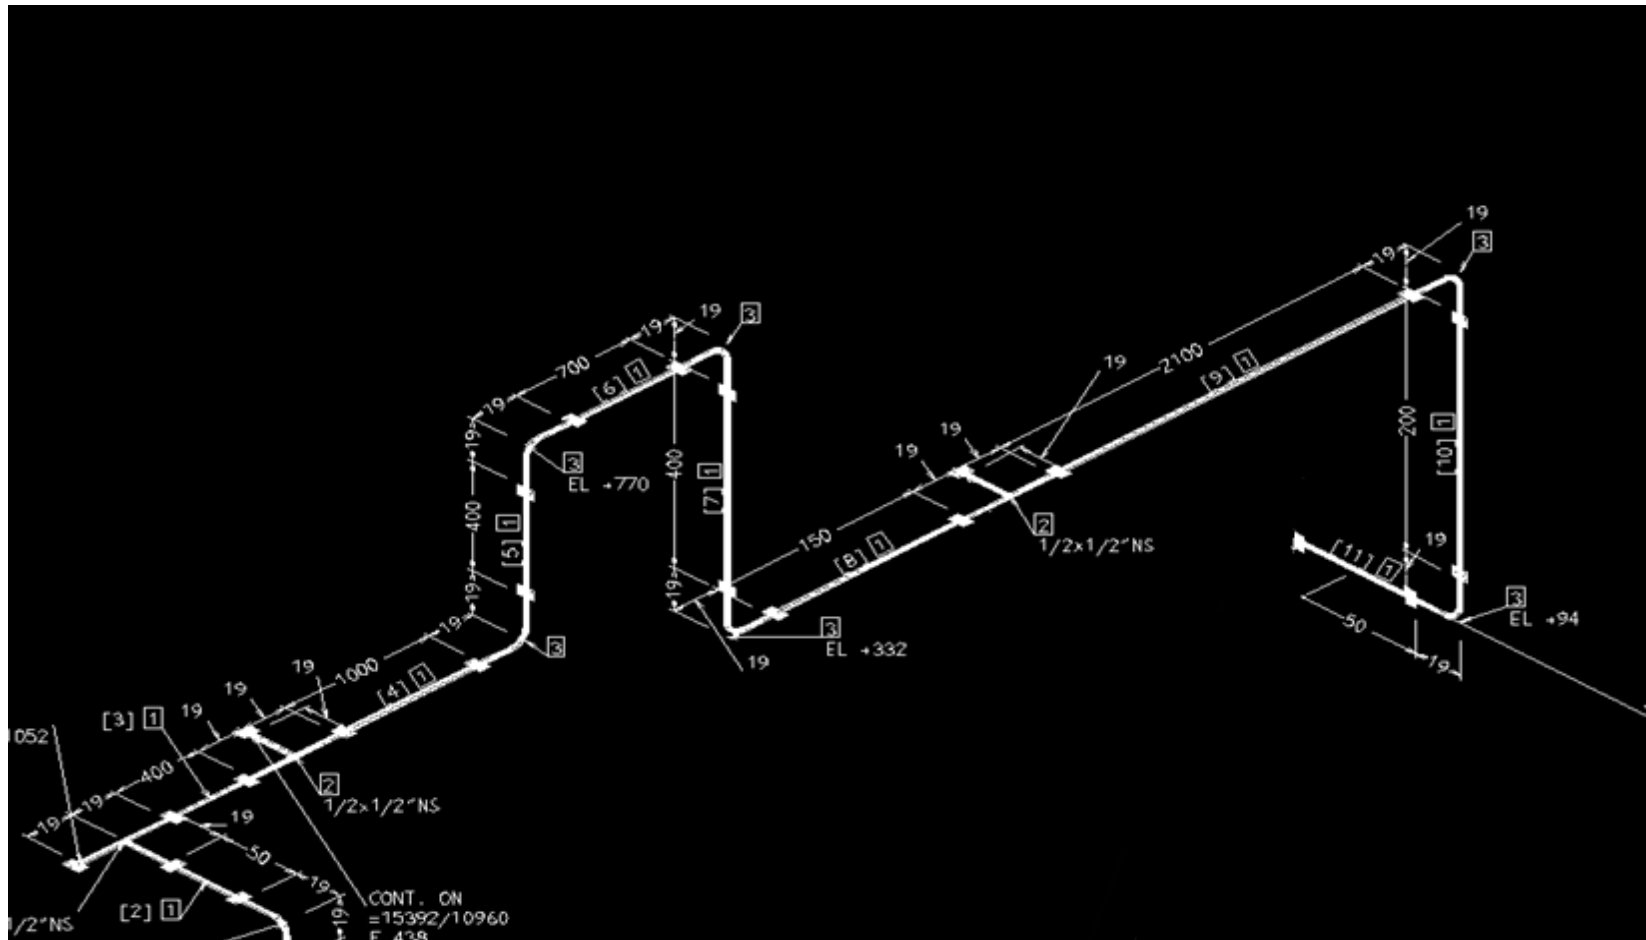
Tubing layout at Gas Engineering Lab (Isometric review)
